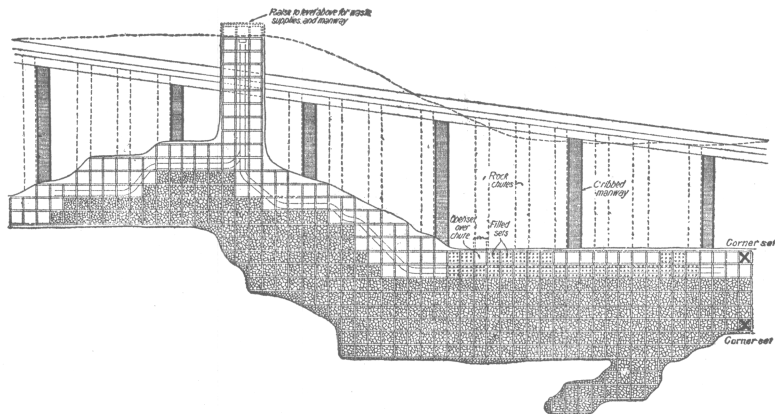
Plan of typical floor, square-set stope, Bunker Hill & Sullivan mine.
